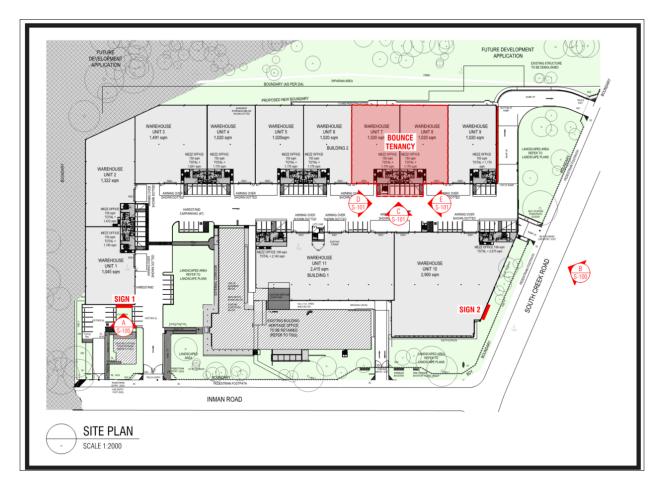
Overall Site Plan (Source: SBA Architects, 2023)
